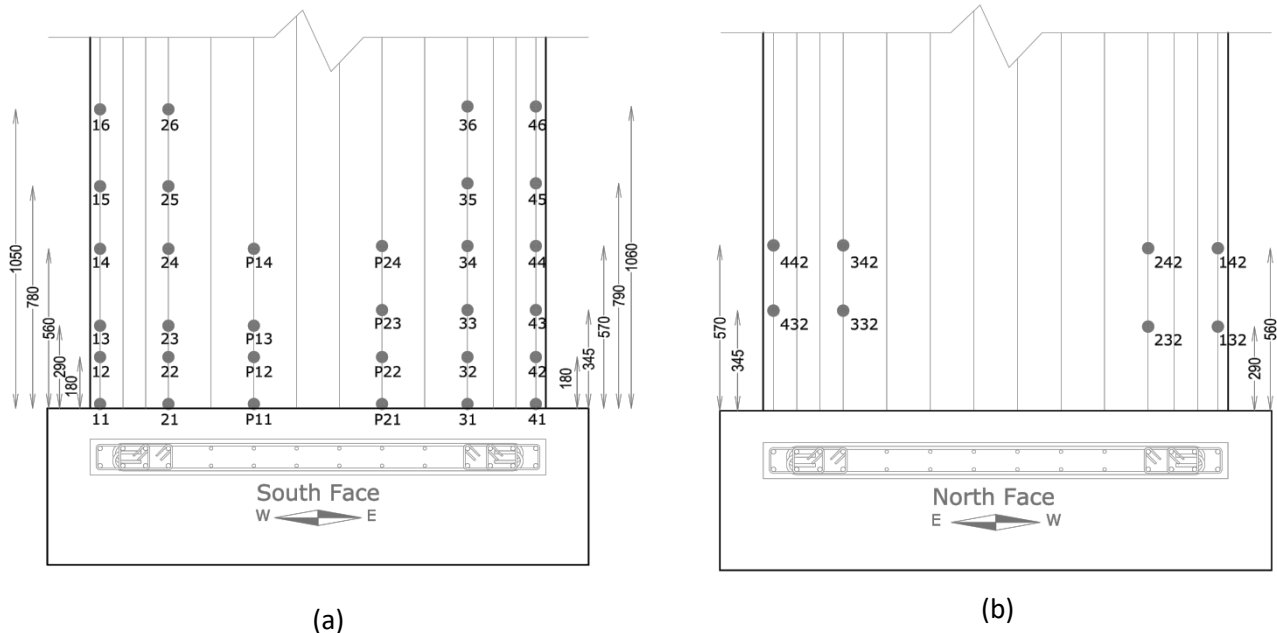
Location of Strain gauges on the longitudinal reinforcement, Specimen RWL: (a) south face; (b) north face
